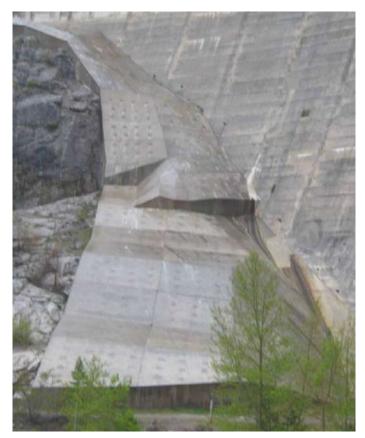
Concrete overtopping protection at downstream toe of dam (Reclamation).
